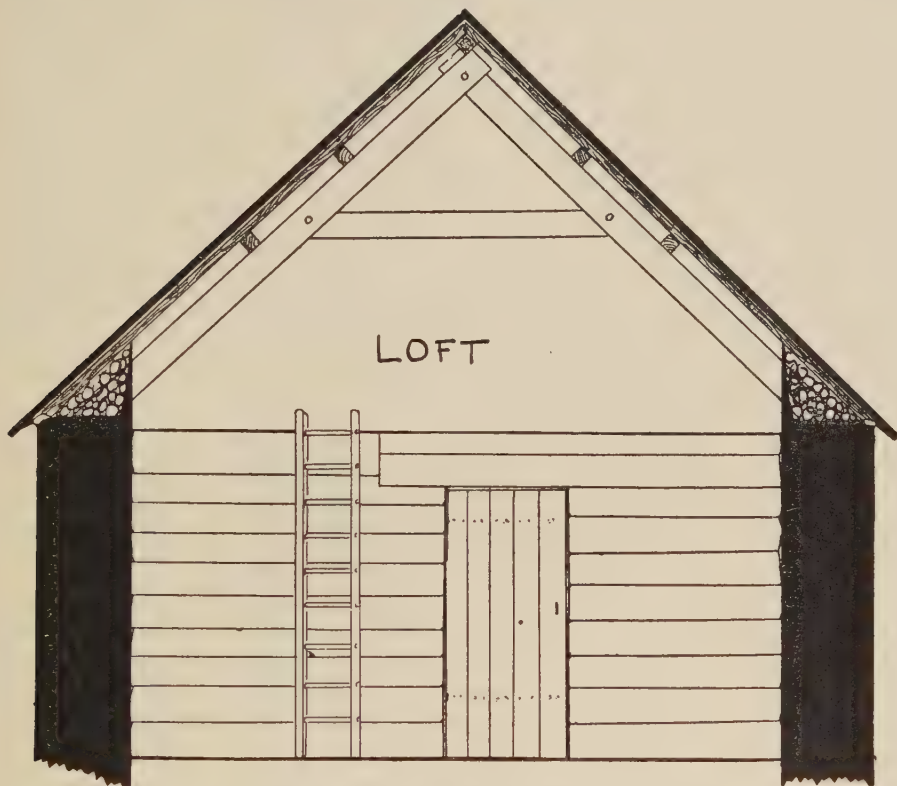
LLAIN-WEN-ISAF: cross-section, line B-B on Plan. Scale as FIG. 2
